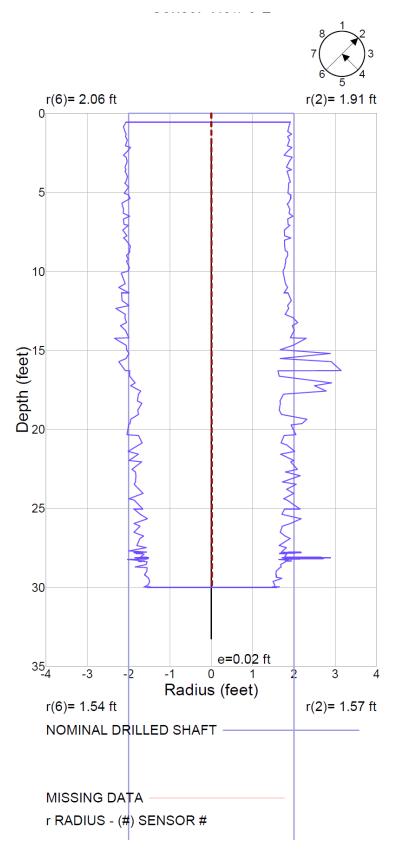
Graph. SHAPE results for sensor view 6-2 in test drilled shaft #1.
